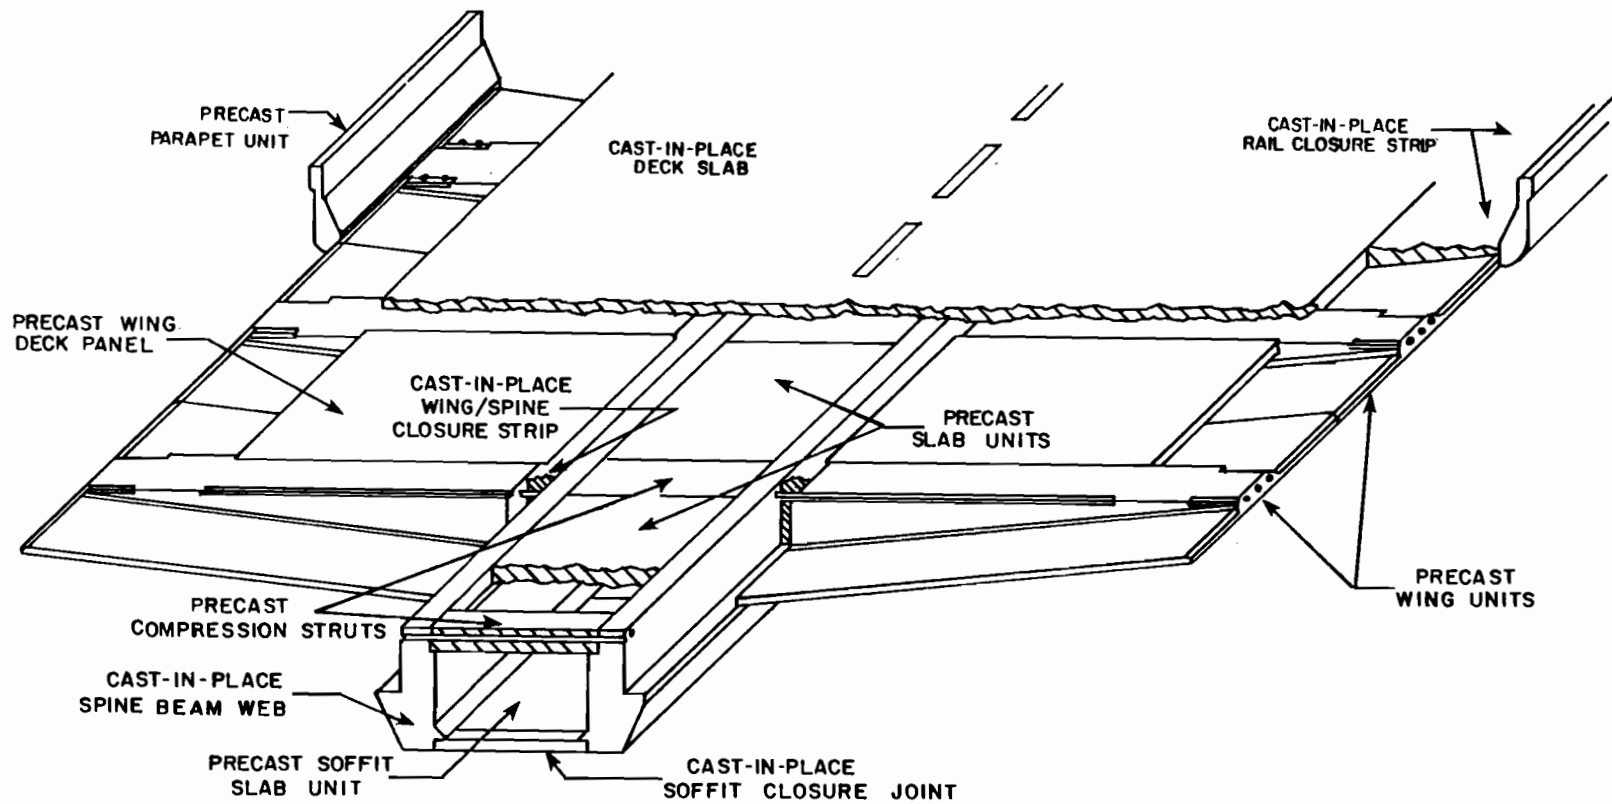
Conceptual view showing assemblage of cast-in-place and precast construction
